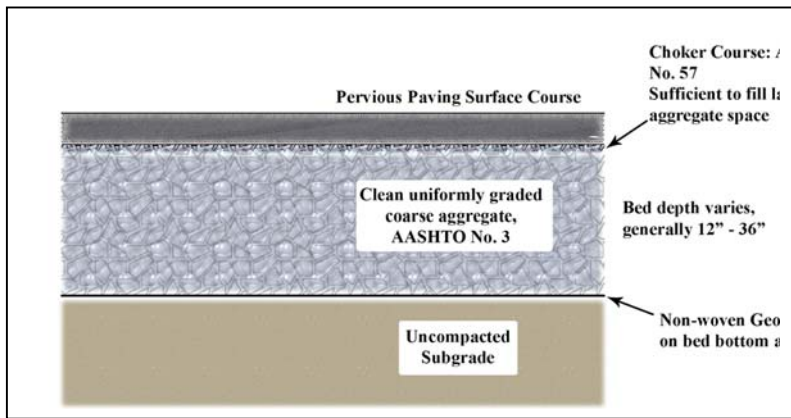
Typical Porous Pavement Section with Subsurface Storage/ Infiltration Bed. (Cahill & Associates.)
